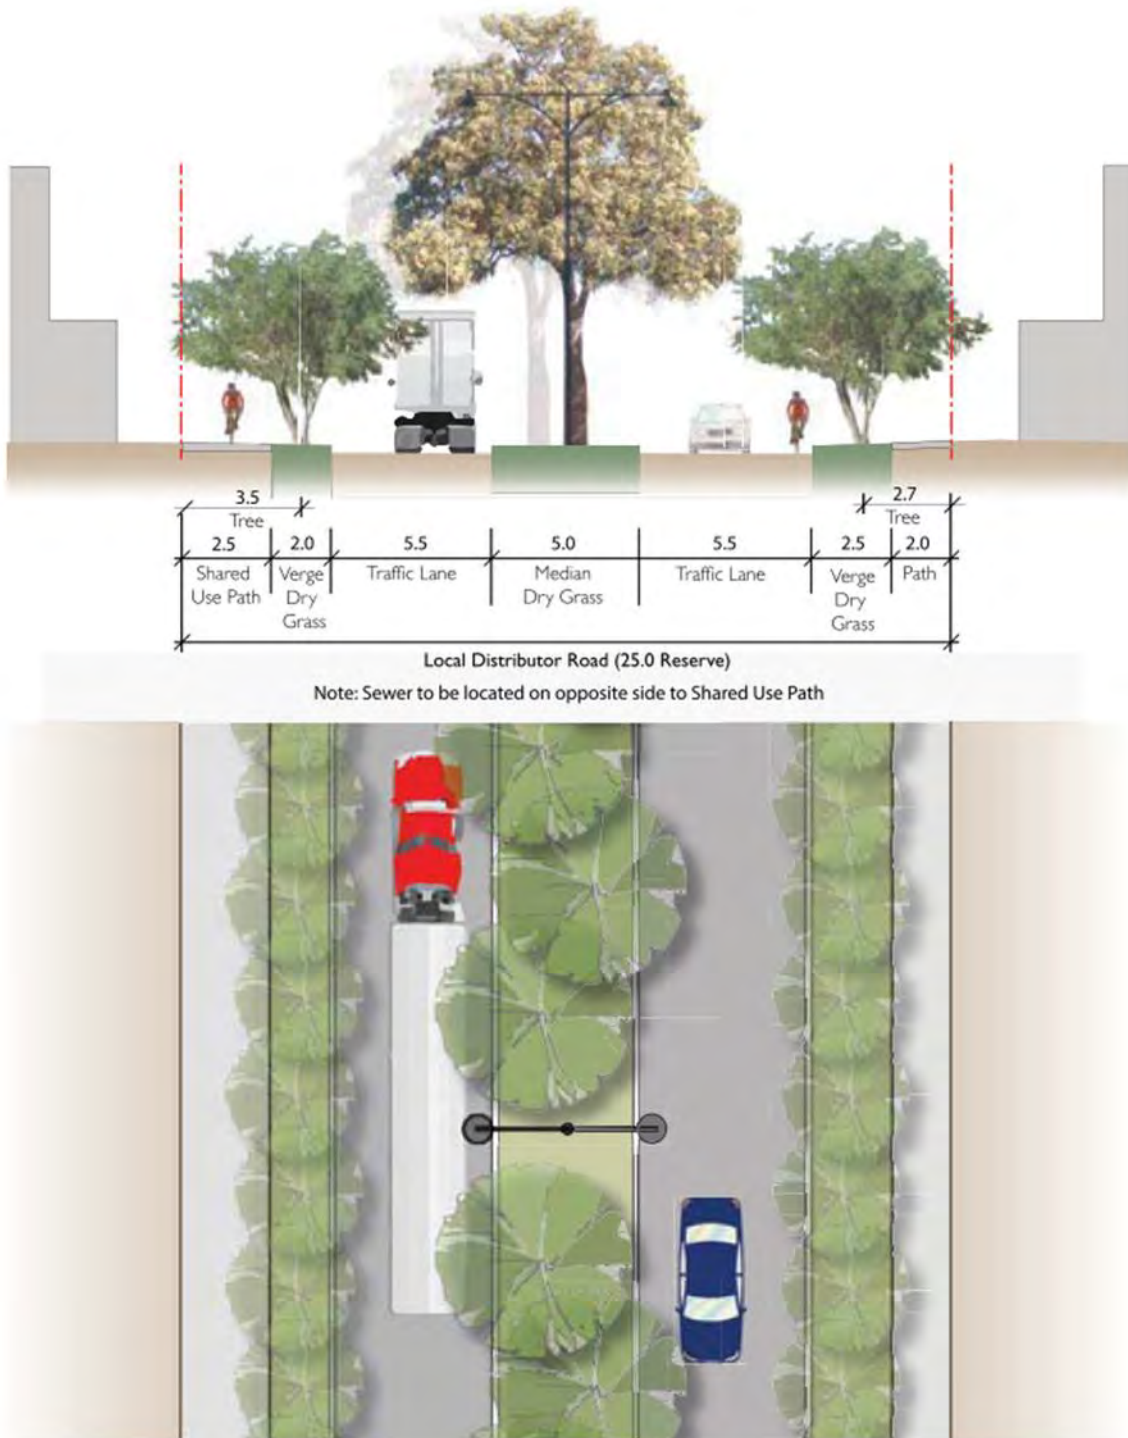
Proposed Road Reservation Width and Cross-Section for the Local Distributor Road
